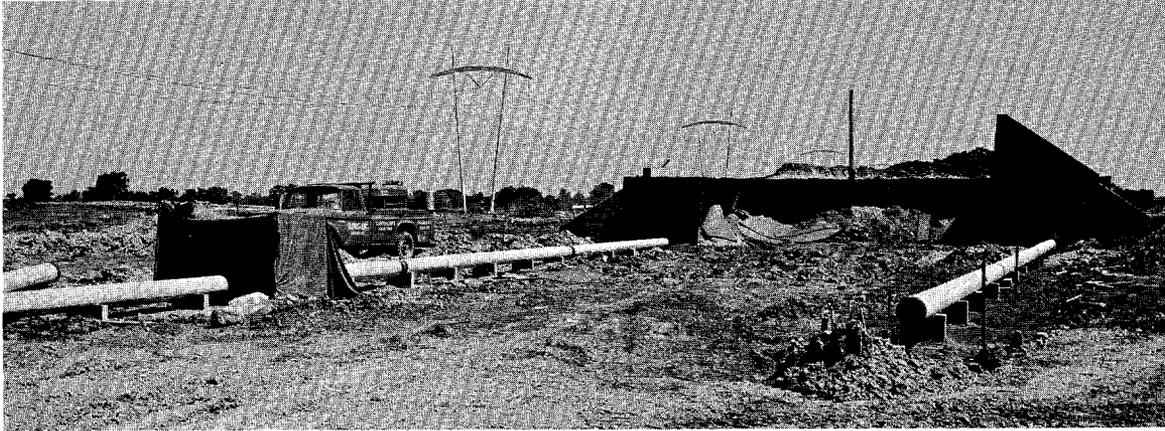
Beam pipes being installed in the Neutrino Laboratory, just north of Batavia Road. The muon beam is at the left, the hadron beam at the right.
